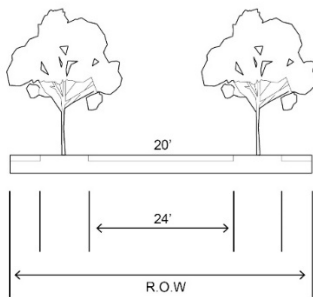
TN-3 Local Street TN-54 Parking on One Side on Two Sides.
